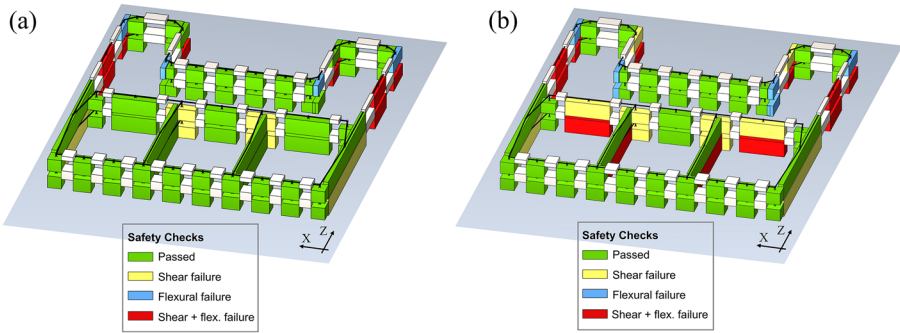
Assessment of the structure in the as-built configuration: a Squared stone masonry (SSM); b Tender stone masonry (TSM)
